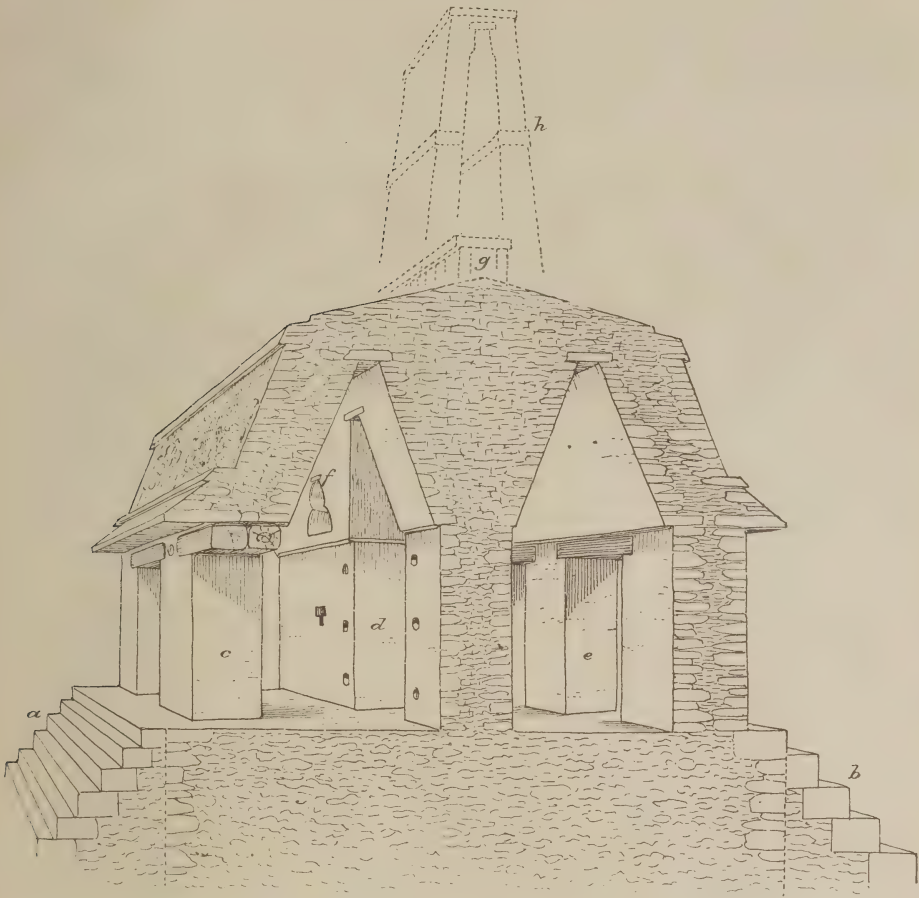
TRANSVERSE SECTION (SOMEWHAT GENERALIZED) SHOWING CONSTRUCTION OF PALENQUE BUILDINGS.
